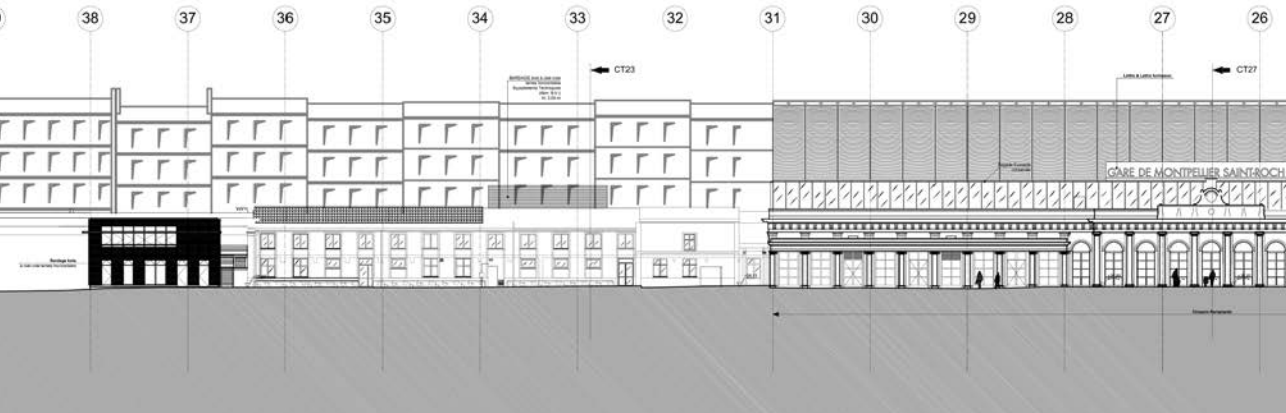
Longitudinal elevation of the new facade of Montpellier Saint-Roch, on top of the old facade
